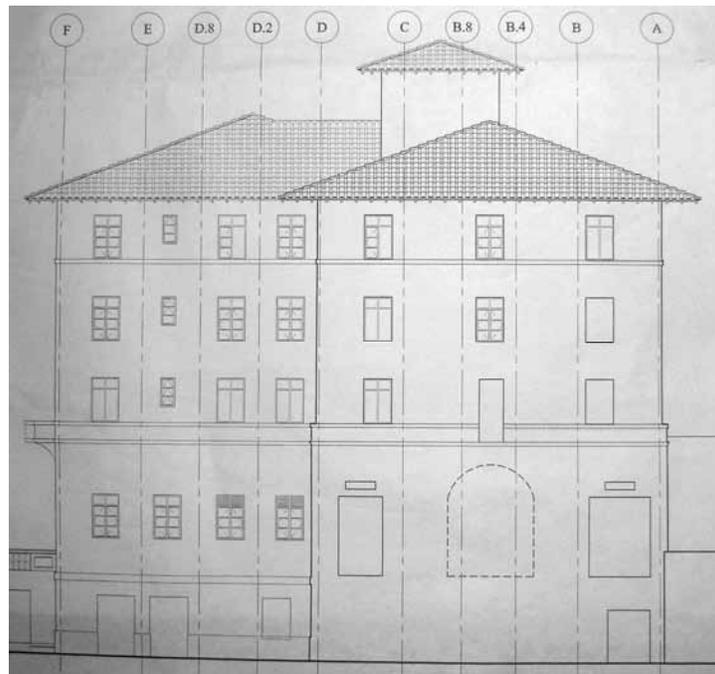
Facade detail from As-built drawing, *The Office of Marvel and Marchand Architects*, October 2002
